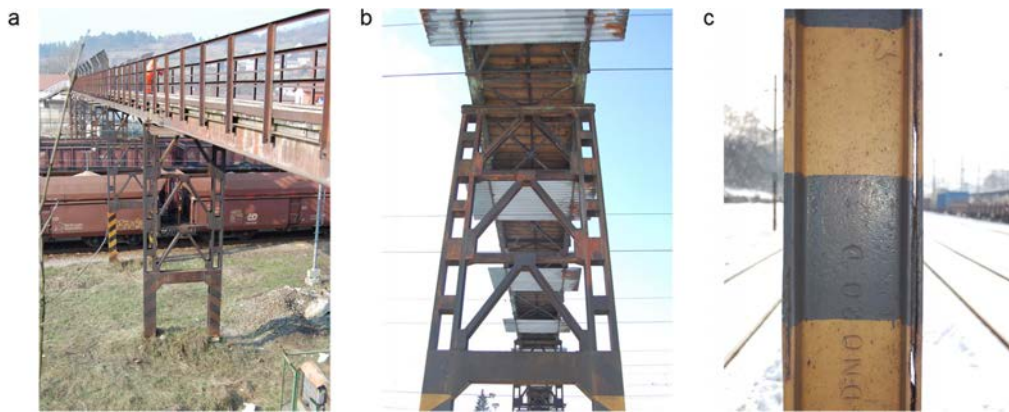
(a) overall view of the footbridge #1; (b) bottom view; (c) crevice corrosion of the pier columns.
